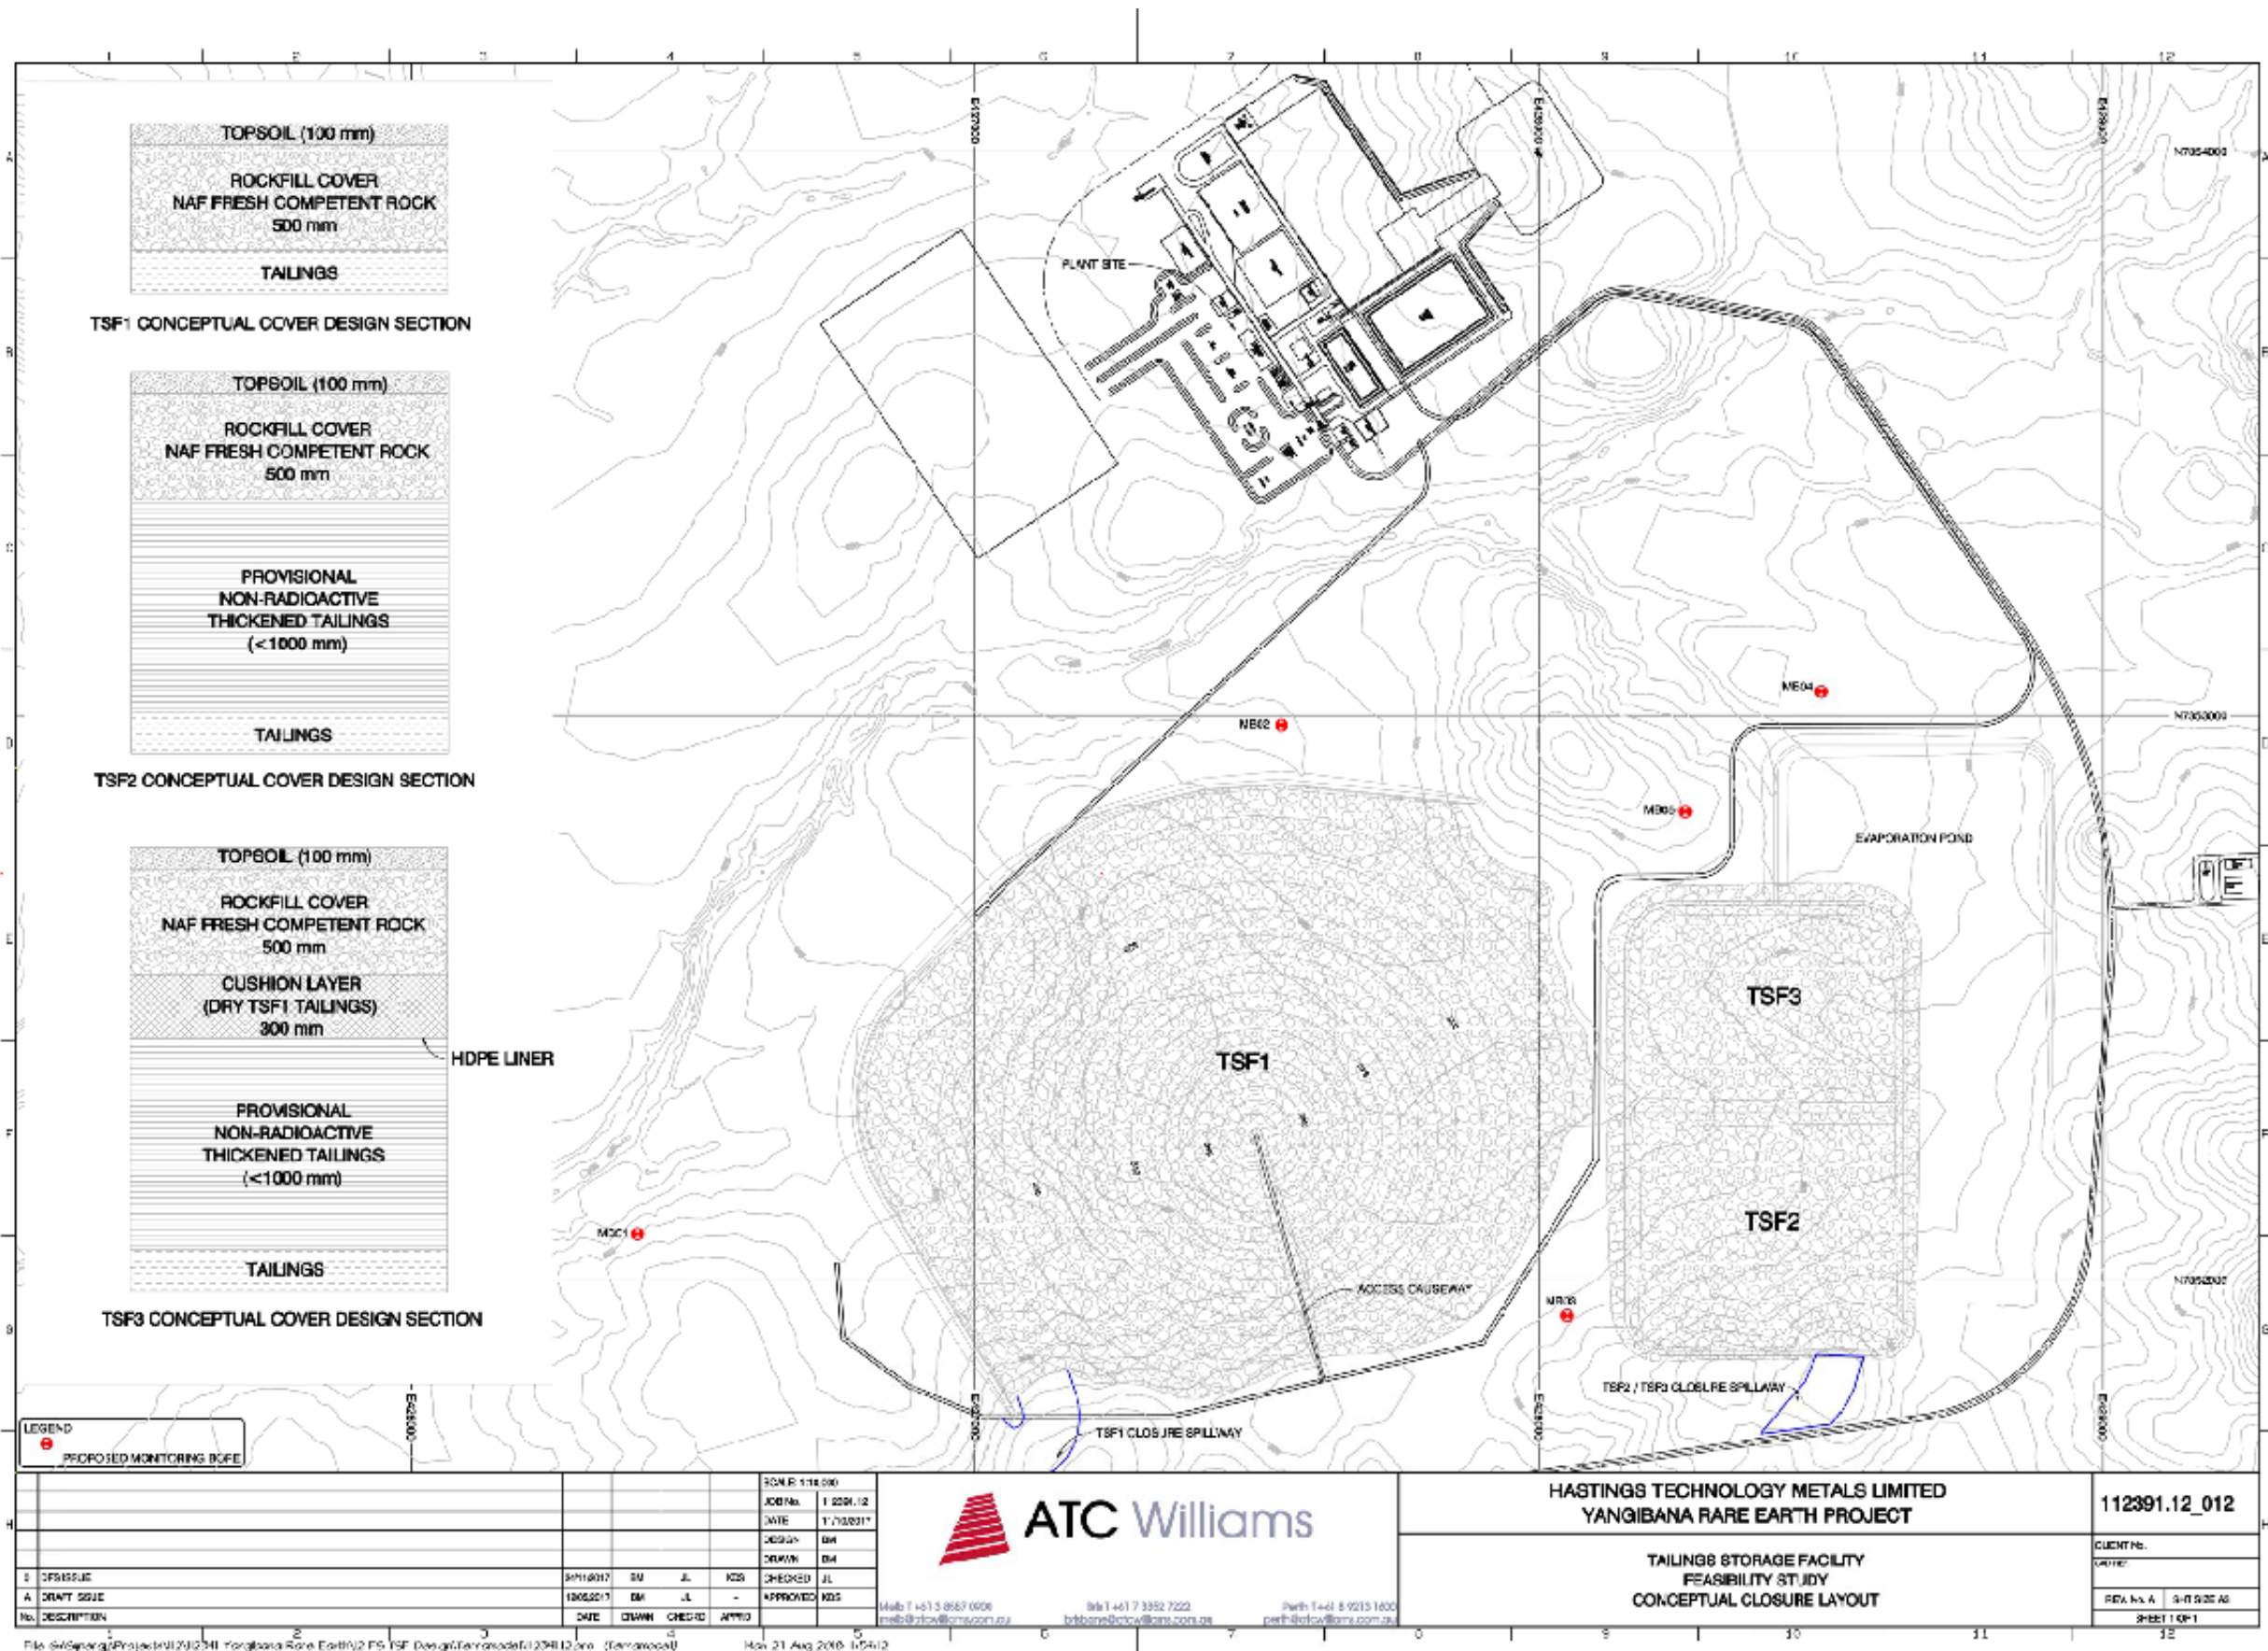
Conceptual layout of the Tailing Storage Facilities at closure
